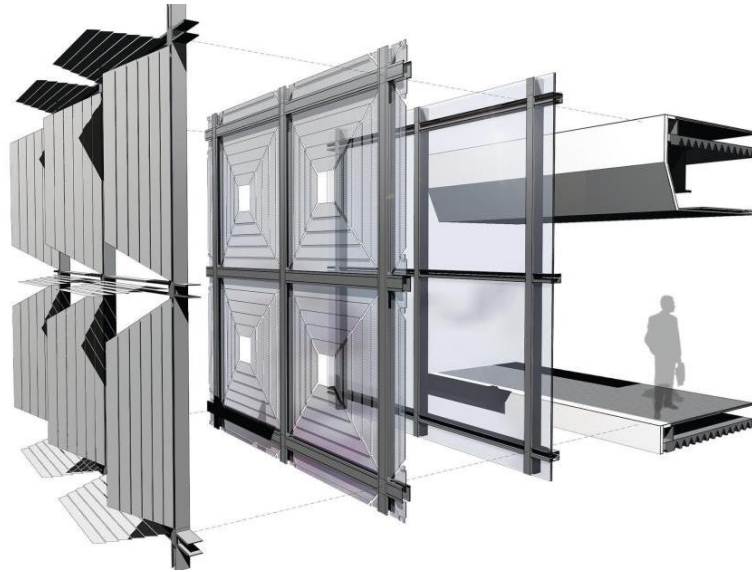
HelioTrace building envelope system, by Skidmore, Owings & Merrill, New York, 2010 (Url-8).
